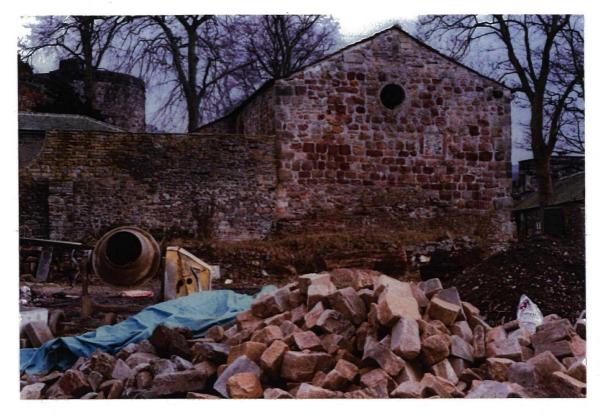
ST. JOHN'S TERRACE, LOOKING EAST, BUILDERS RUBBLE
